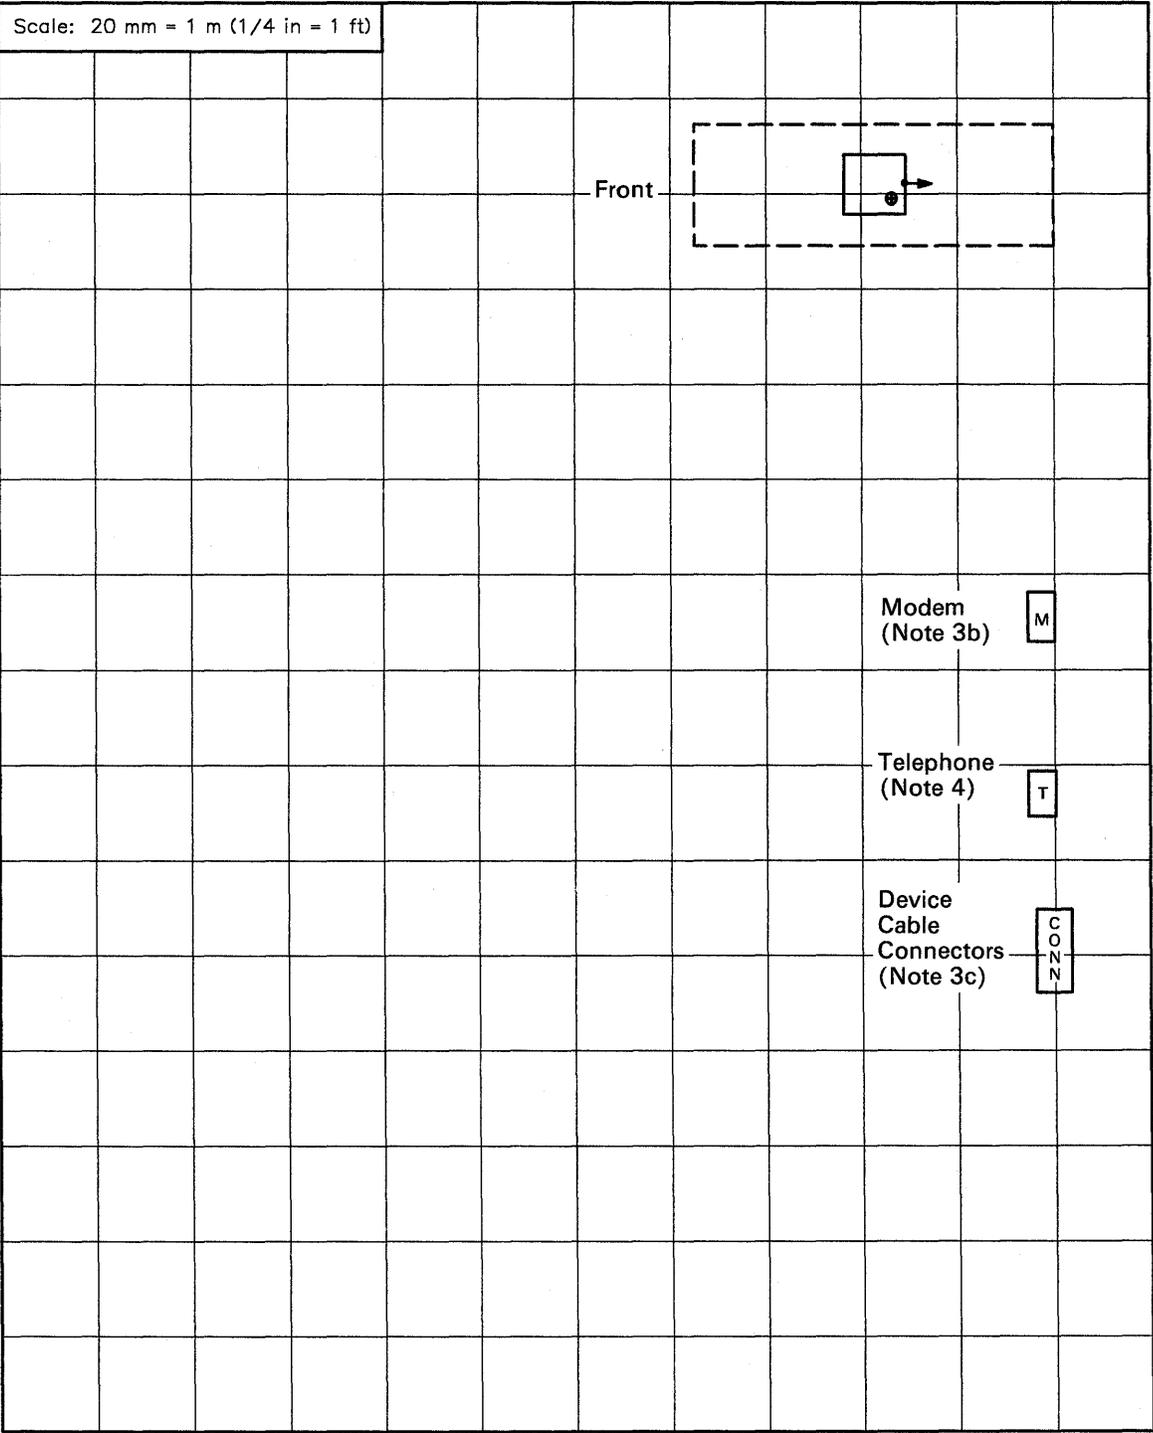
An Example of a Site Floor Planning Worksheet for Models 81R, 82R, 91R, and 92R
